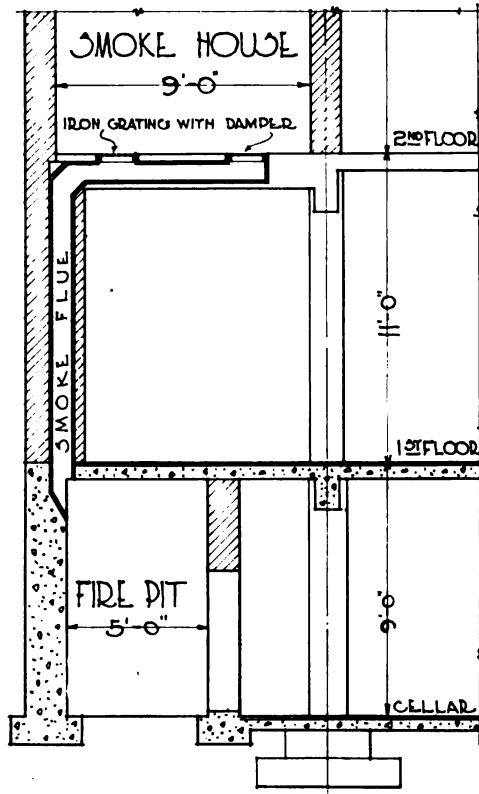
FIRE PIT IN CELLAR AND SMOKE HOUSE ON SECOND FLOOR.
